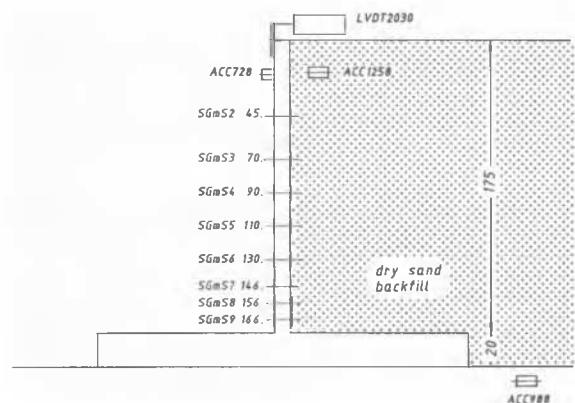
Typical Section of a Fixed-base Cantilever Model (dimensions in mm)
